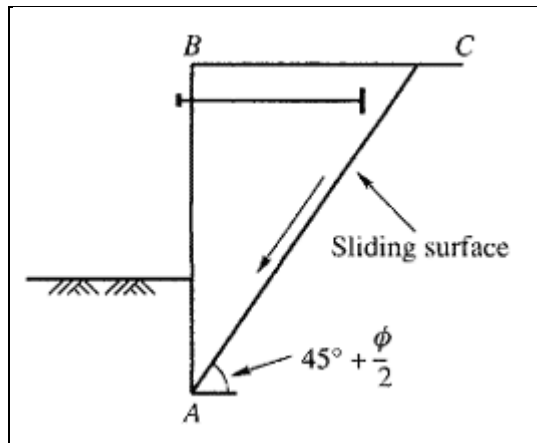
An idealized shape of sliding after wall installation during excavation stages [66, 67]
